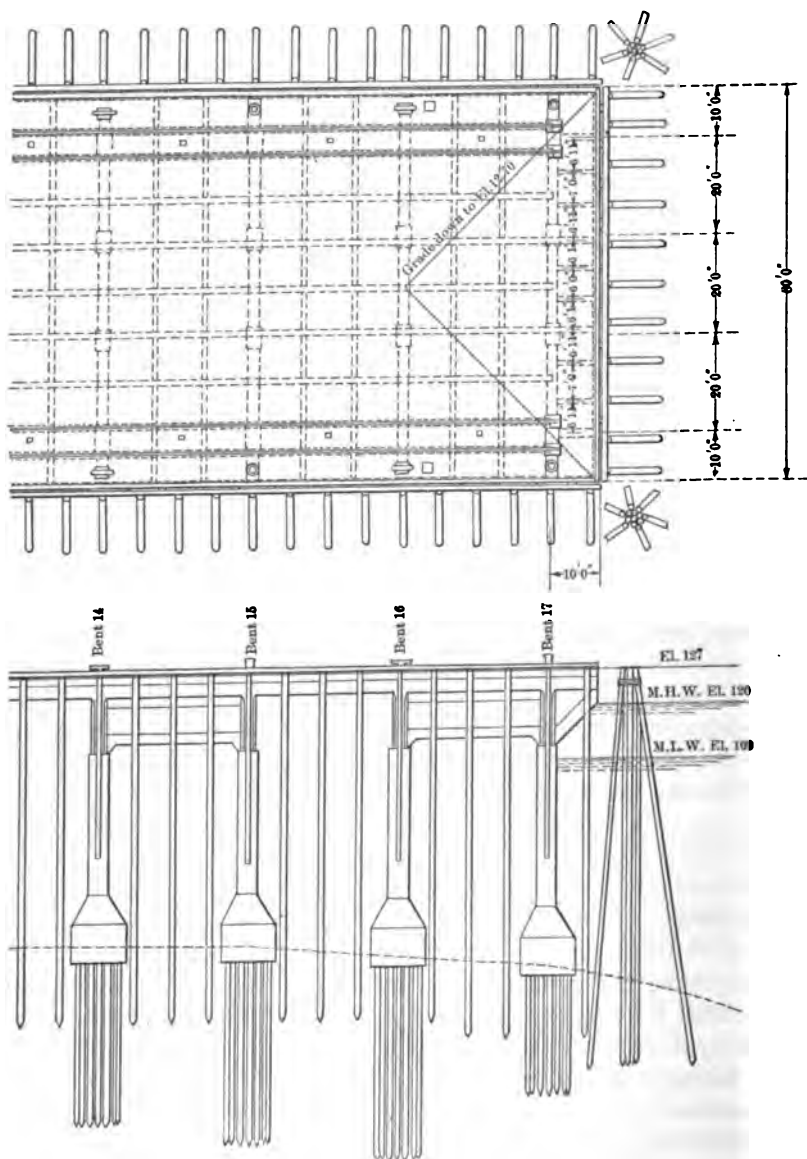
NAVY CONCRETE PIER, GENERAL PLAN.
